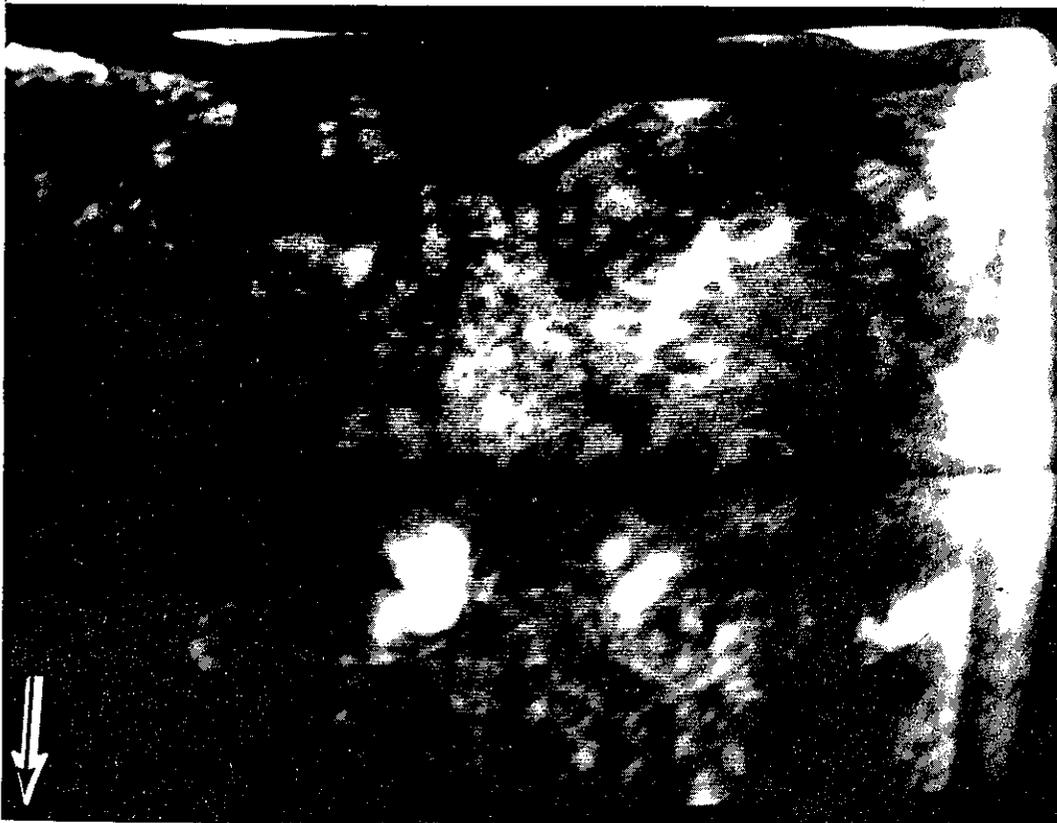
Boring R-6 Anderson Grade 110.0 ft. Fractured greenstone with chips plucked from wall by drill bit.
